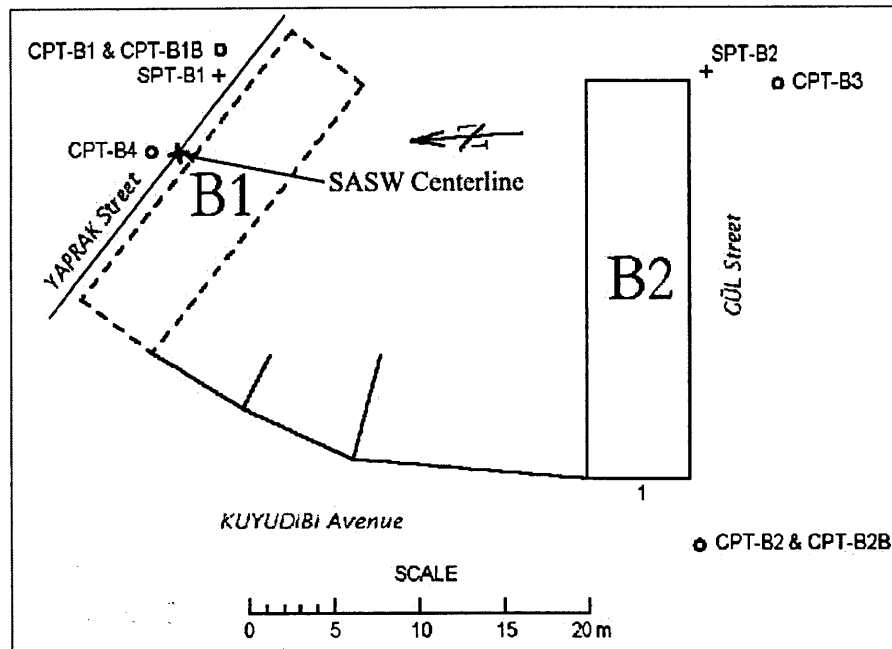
Plan view of Site B showing the location of one SASW centerline (modified from <http://peer.berkeley.edu/turkey/adapazari>).
